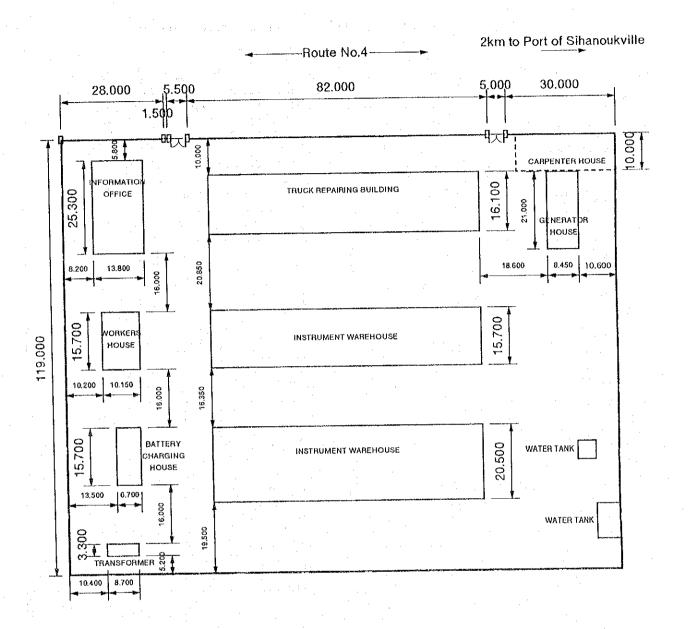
(1)-14 Layout plan of Work Shop
